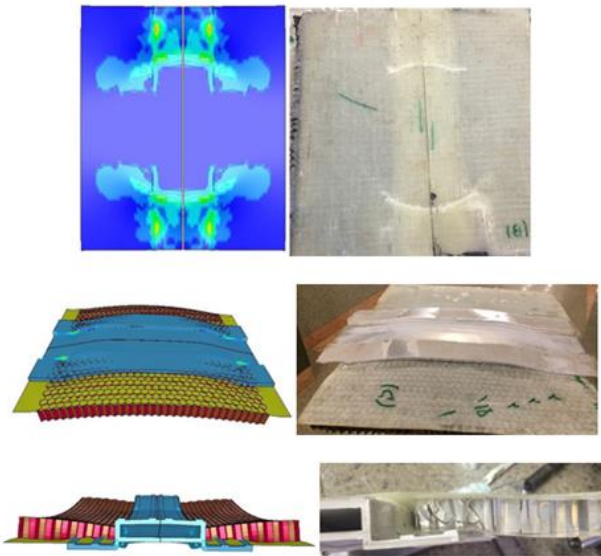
Failure modes after performing bending test on the plates with connection type 1 (Numerical and experimental)
